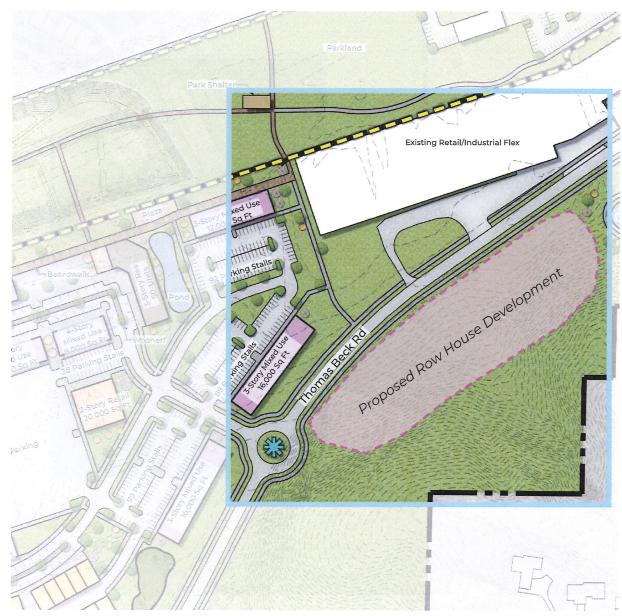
Final South of Gray's Lake Master Plan - Proposed + Existing Development
